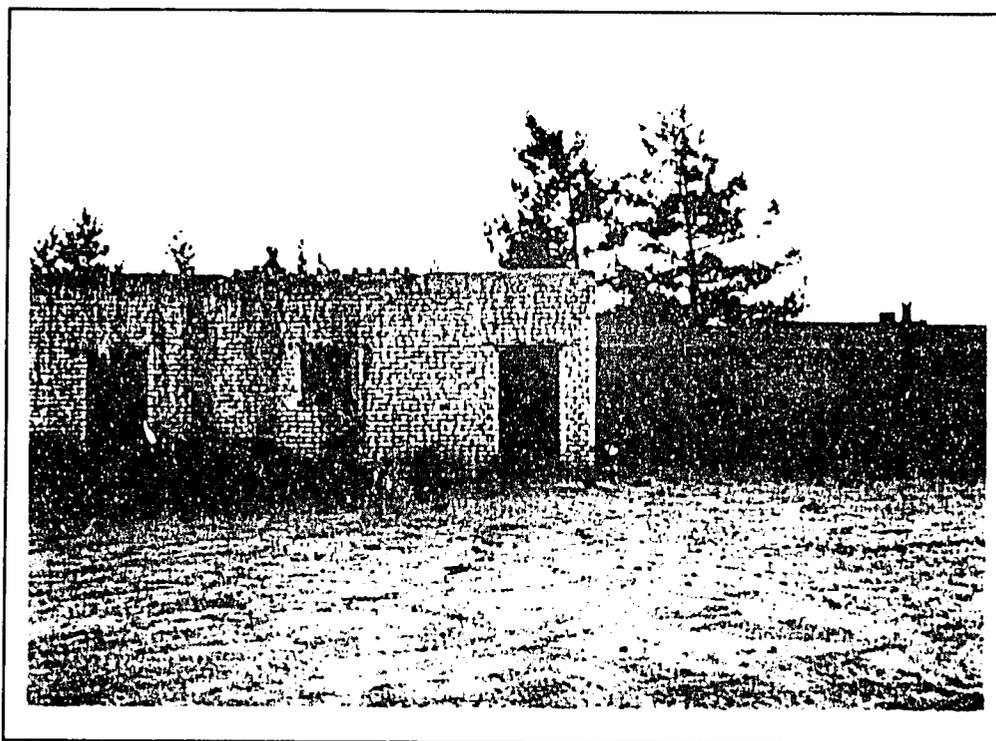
Quetta HF Base Station Antenna Site. Part of West Wall.
